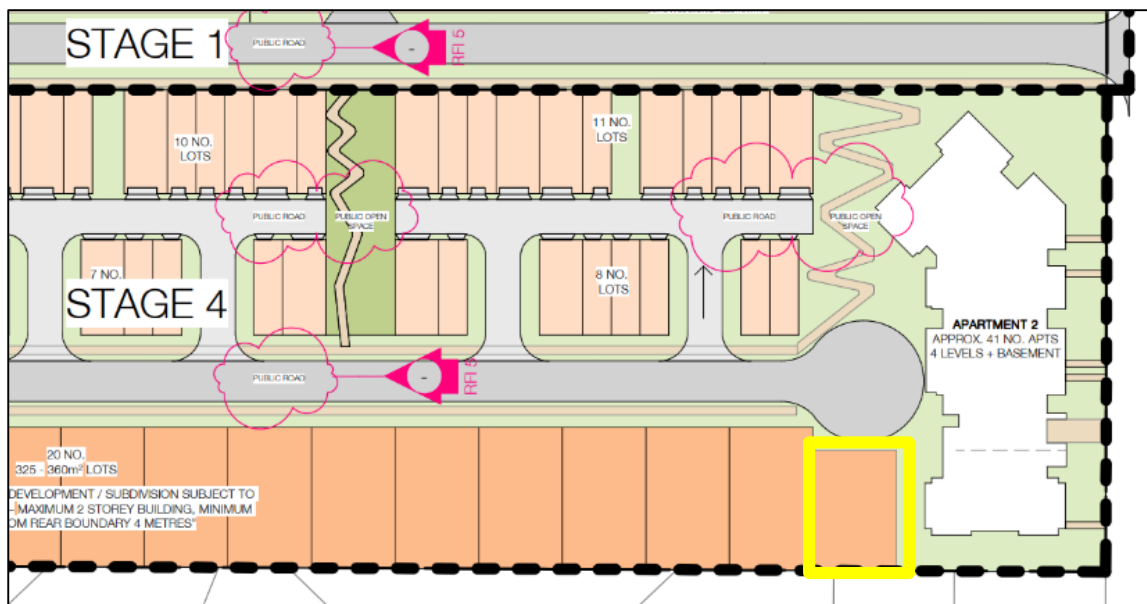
Plan showing location of 'vacant lot' for to visitor car parking
